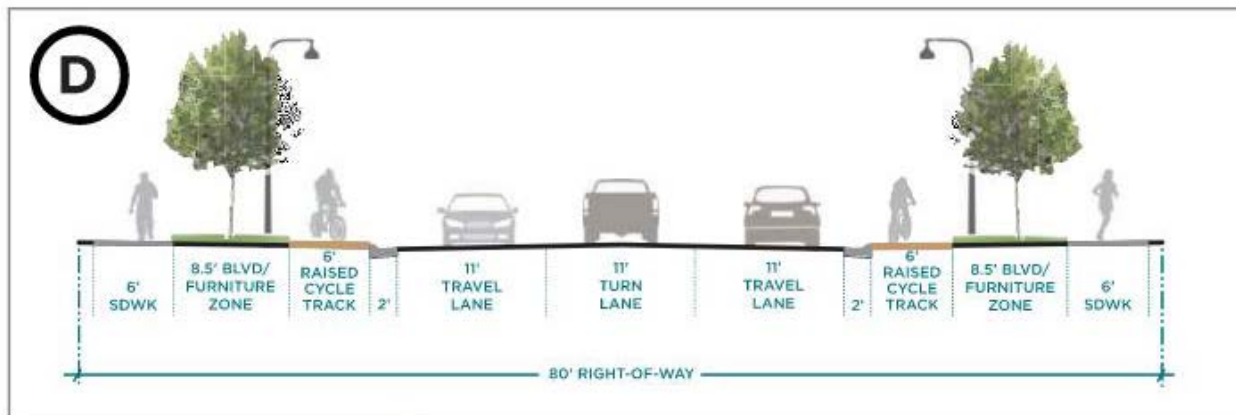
Preferred Alternative East Missoula Typical Section Looking East
